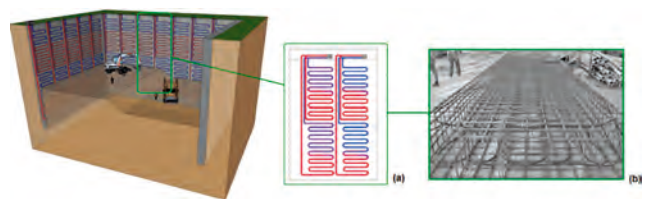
Retaining structure used in energy facilities: a) pipe-positioning scheme in a structure: b) geothermal pipes attached to a reinforcement [14]
